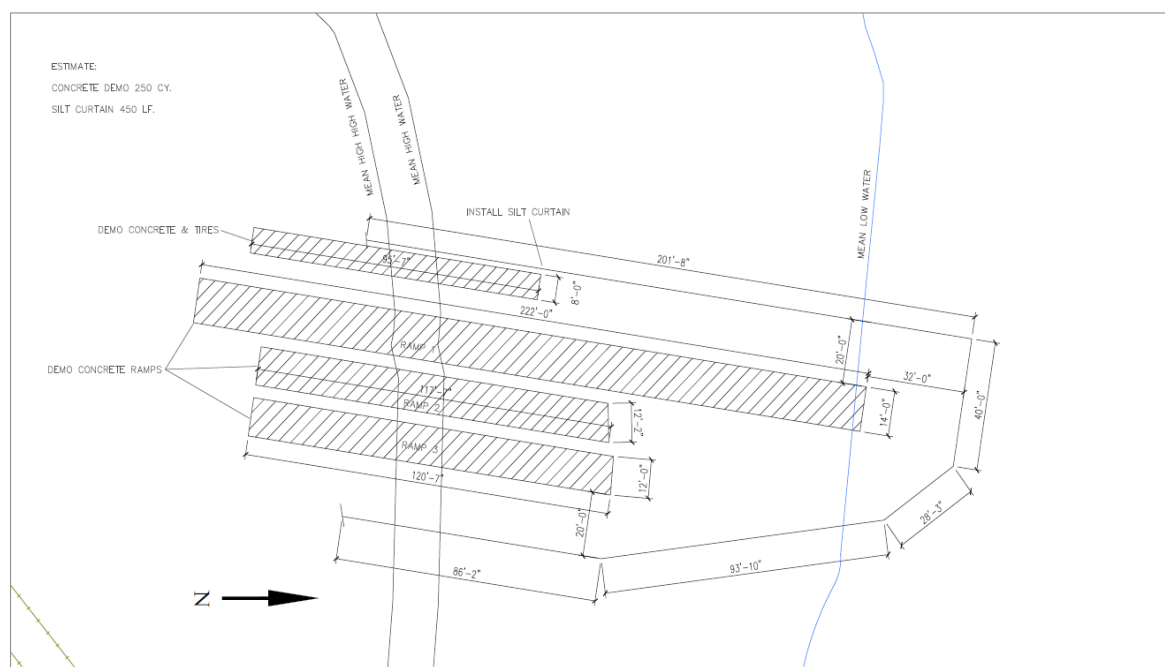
Plan view of existing boat ramps and concrete tires to be demolished
